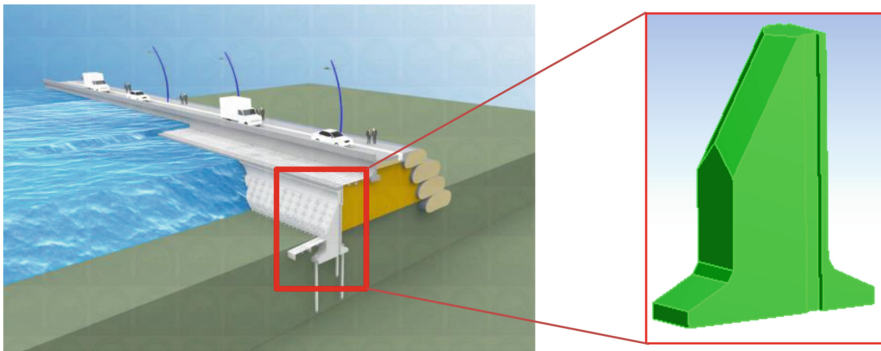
Innovative interlocking revetment model and hollow concrete block.
